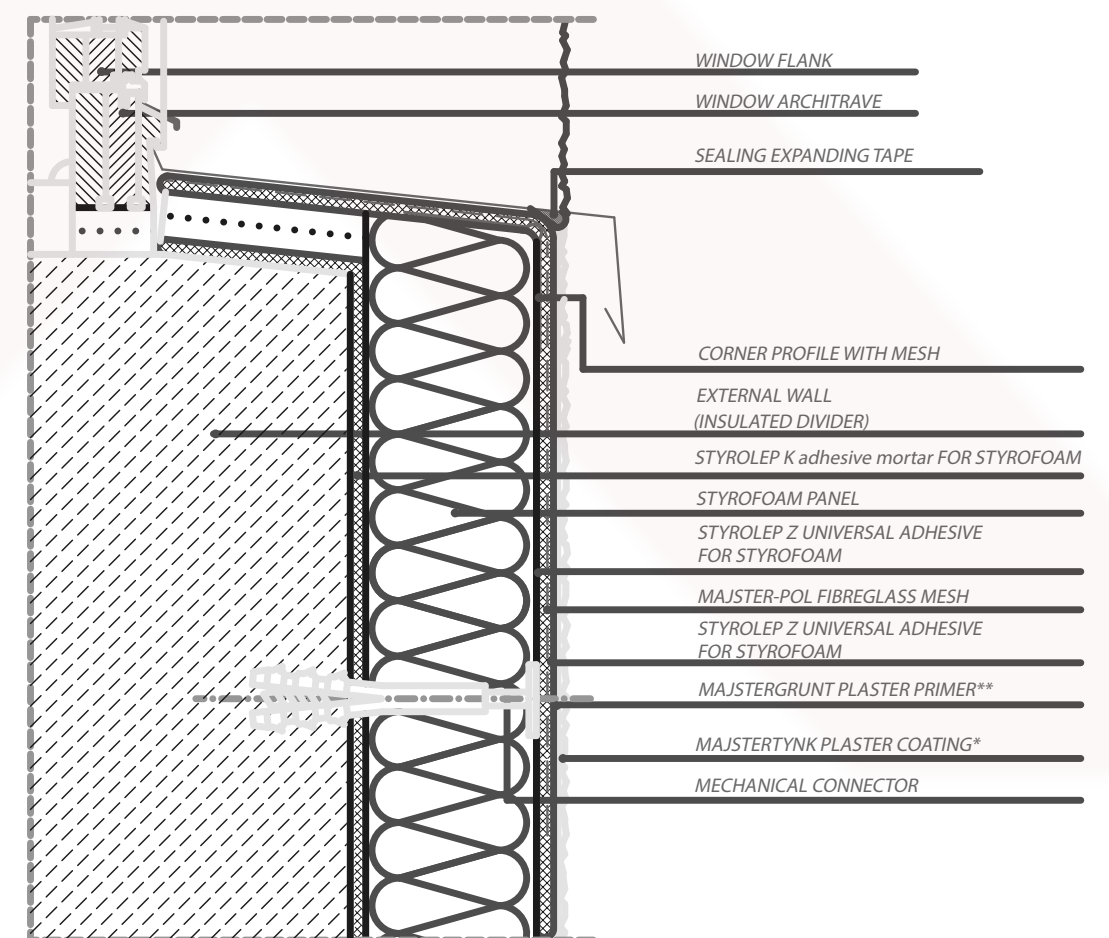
Closeup of window sill treatment. (vertical cross-section)
